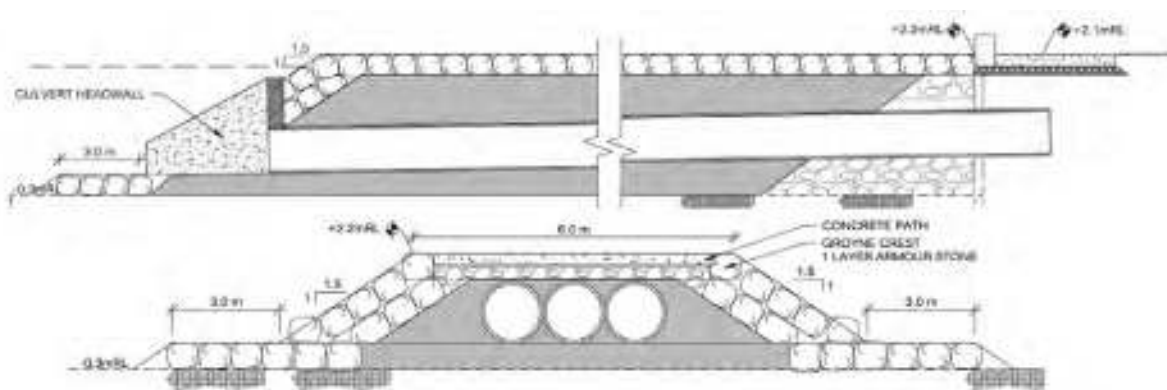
Indicative cross sections of a culvert extension/groyne structure at Macleod's beach
